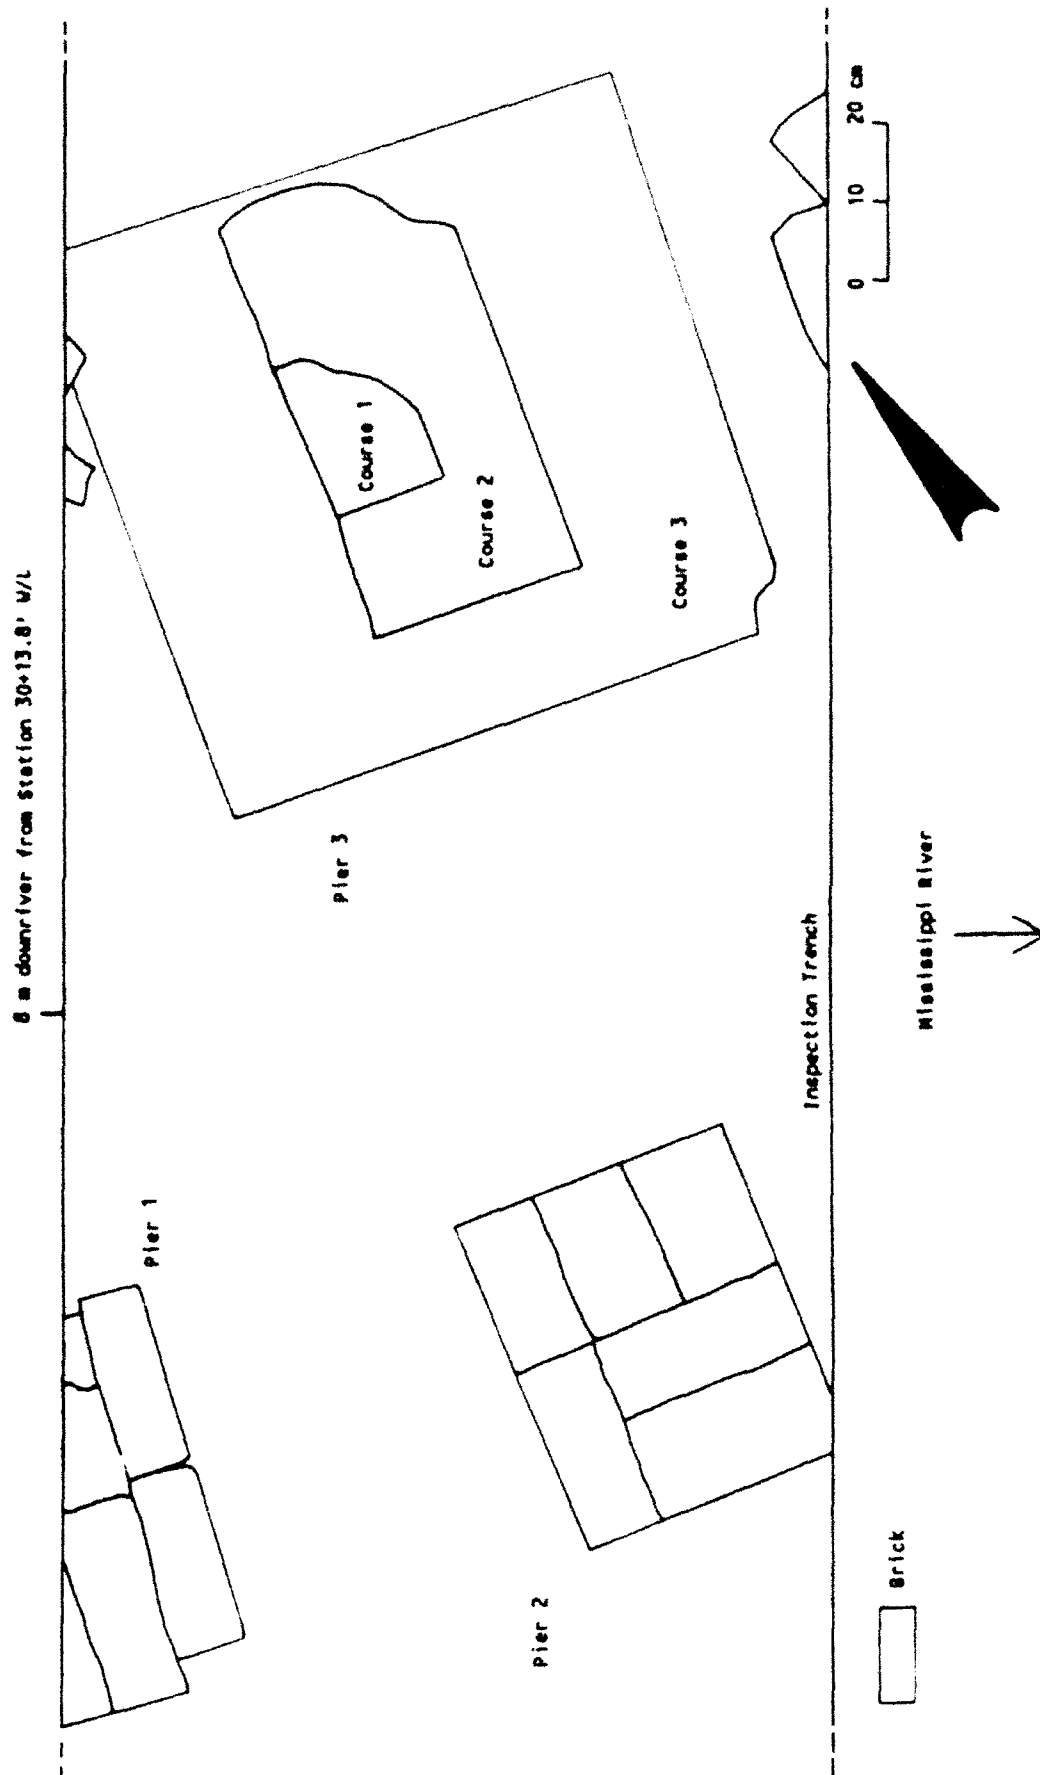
Plan of trench from 7 m to 9.5 m downriver from Station 30+13.8' W/L, showing piers.
